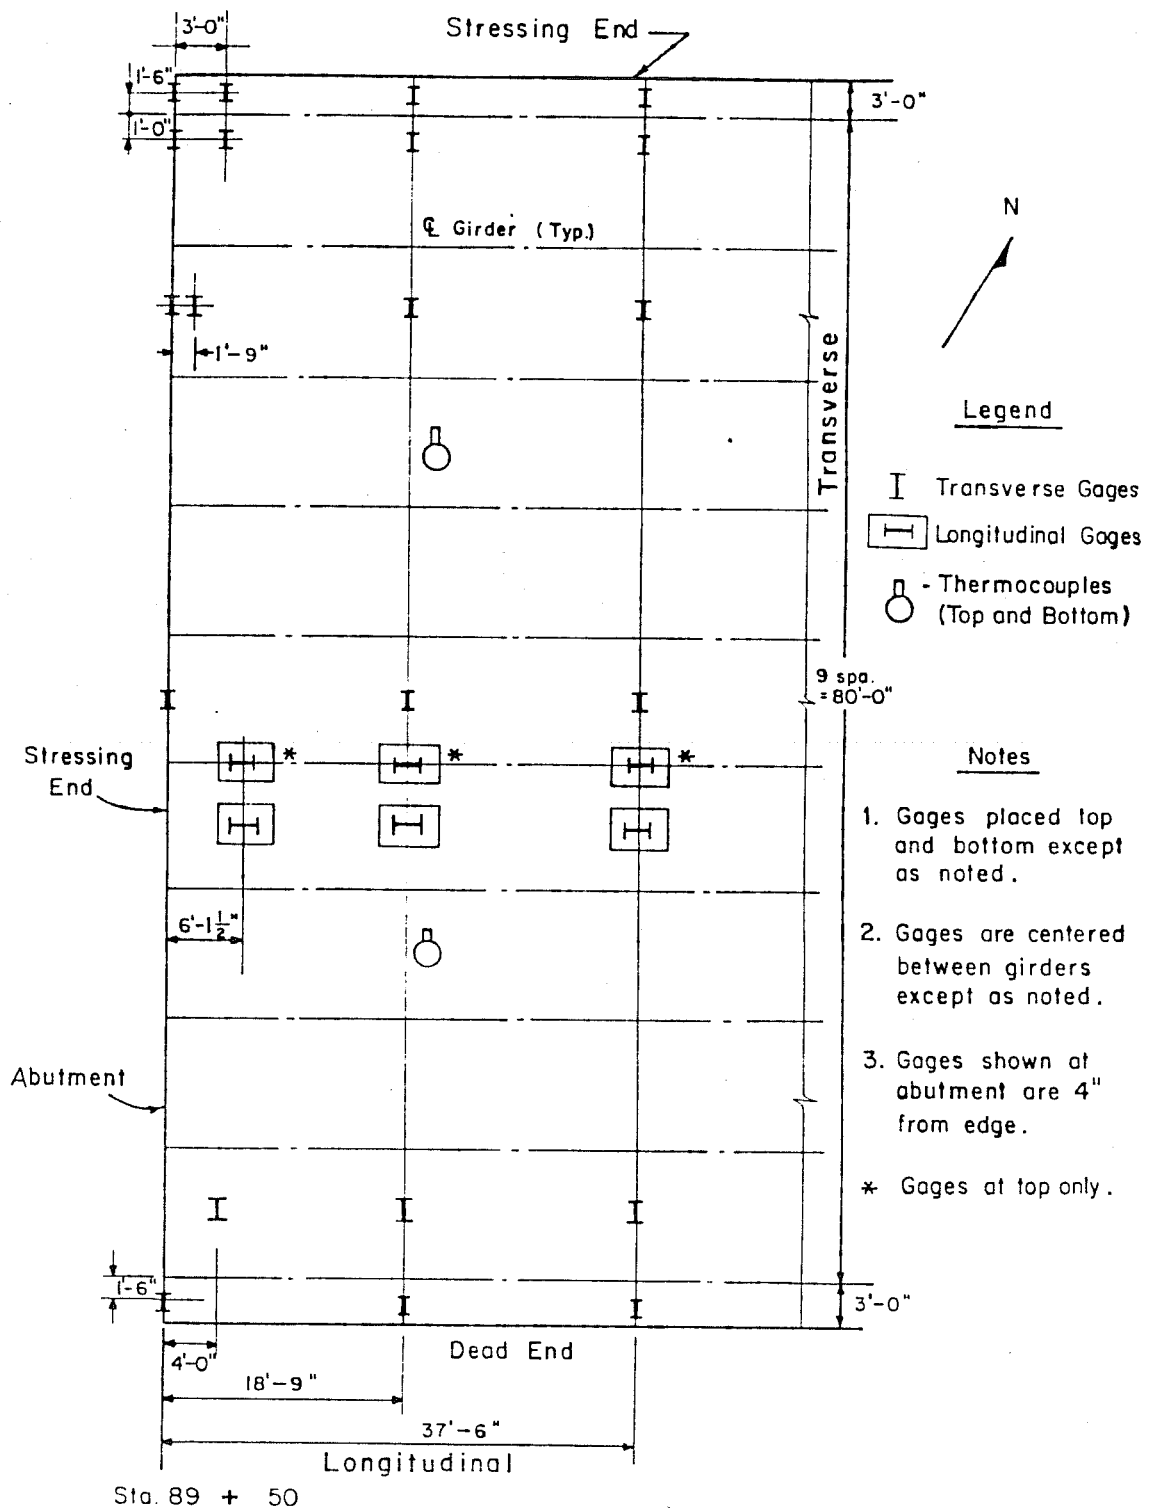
Instrumentation locations for section with both transverse and longitudinal post-tensioning
